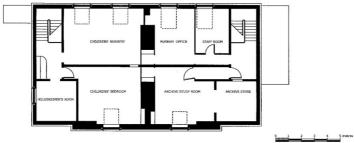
The Decimus Burton Museum - proposed first floor plan. Copyright Paul Avis
